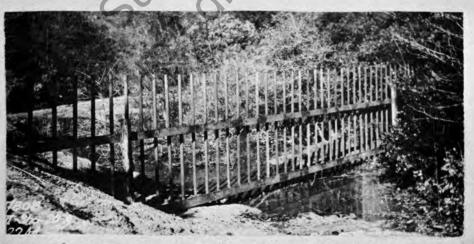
Post and rail debris rack, in place for 35 years, for light to medium floating debris installed 100' upstream of culvert.
